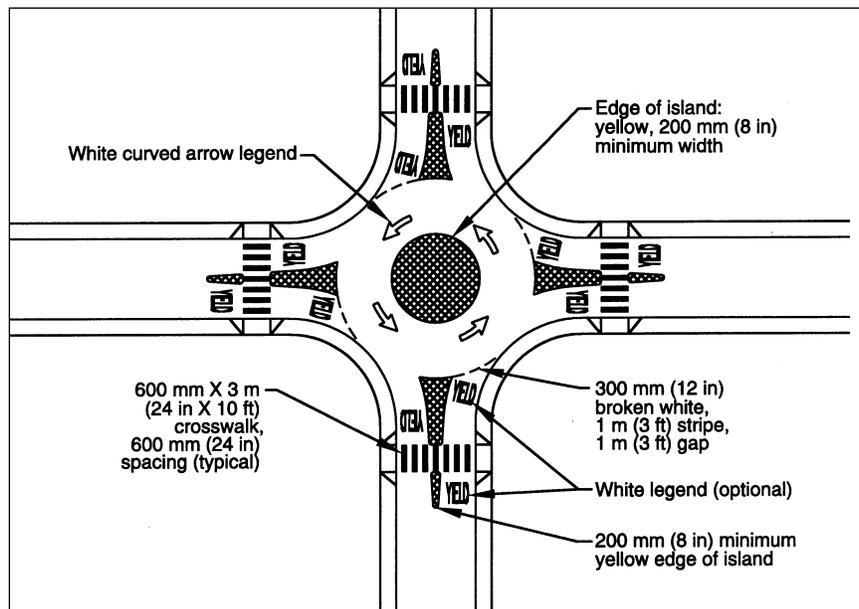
Sample pavement marking plan for a mini-roundabout.
